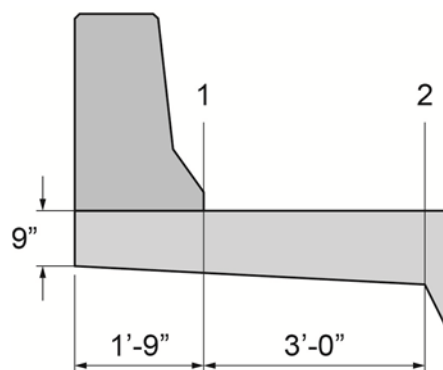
Critical Sections for Overhang Design to Develop Barrier Railing
